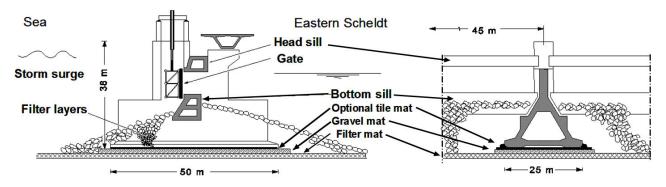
Storm surge barrier in the Oosterschelde: cross-section and longitudinal section
